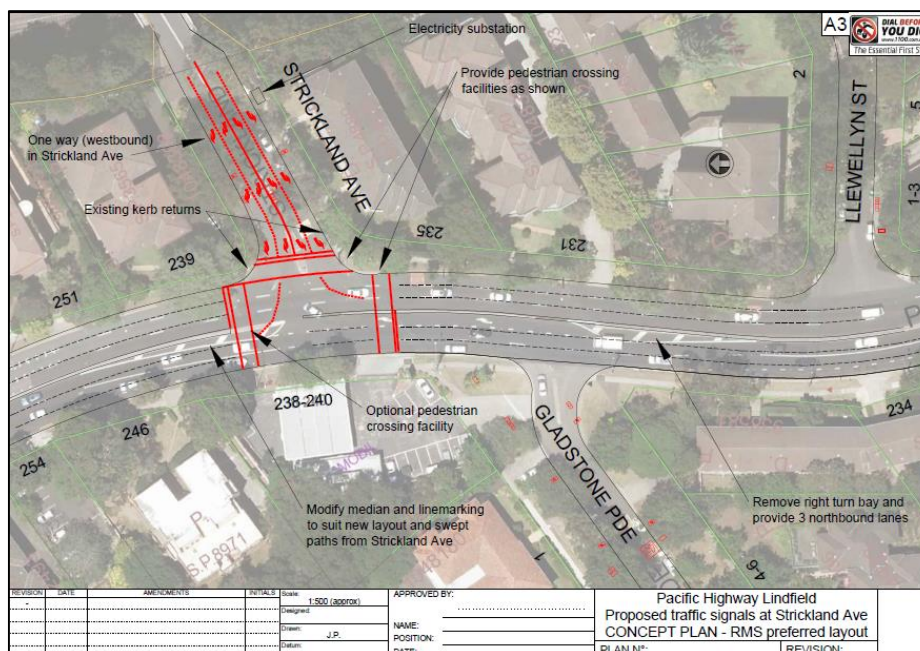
Proposed Strickland Avenue Concept Plan, no right turns
